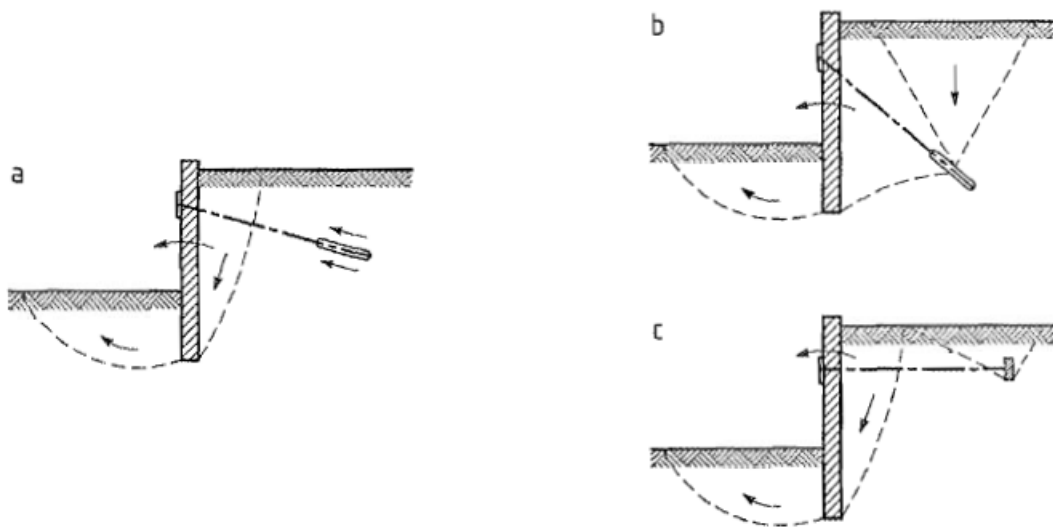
Examples of Limit Modes for Failure by Pull-out of Anchors
